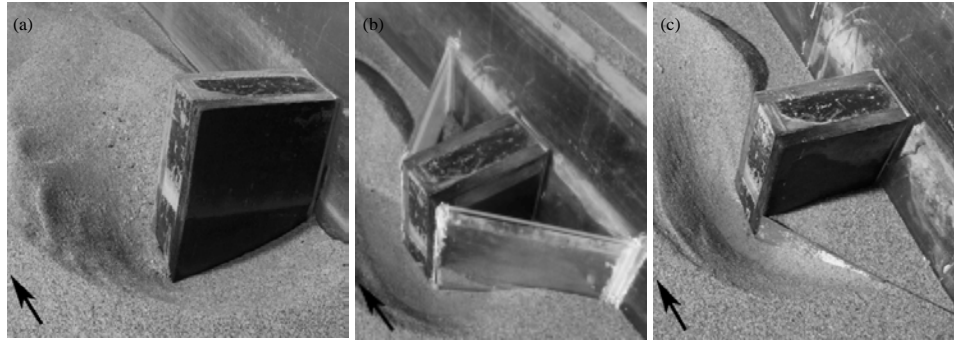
(a-c): Different experimental setup. (a) Vertical wall abutment (VW), (b) Wing wall abutment (WW) and (c) Buried wall abutment (BW)
